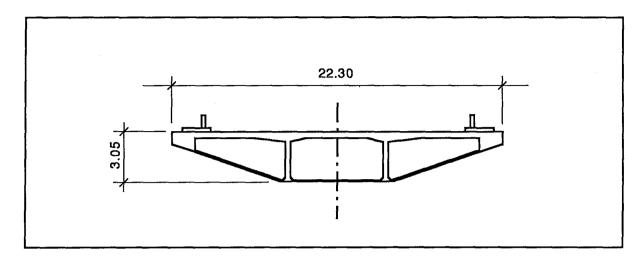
CROSS SECTION OF THE ACCESS SPAN DECK (In meters)
